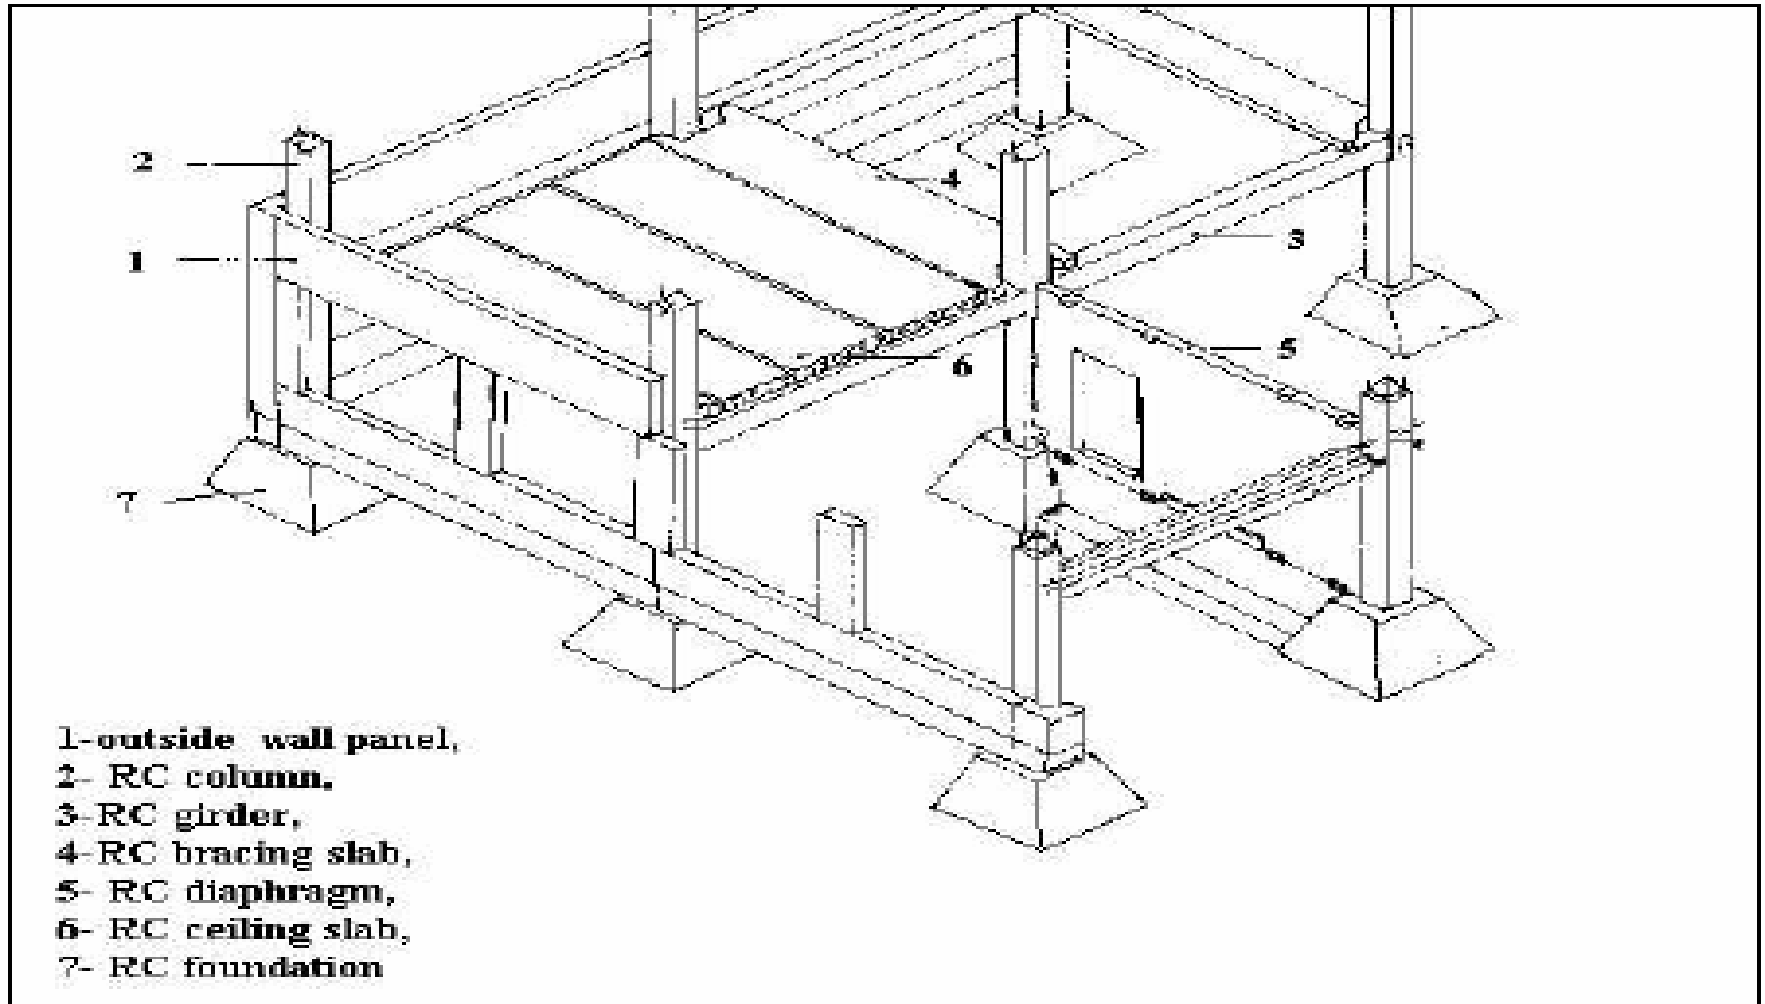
Components of a precast reinforced concrete frame system of Seria IIS-04 (WHE Report 66, Uzbekistan)
